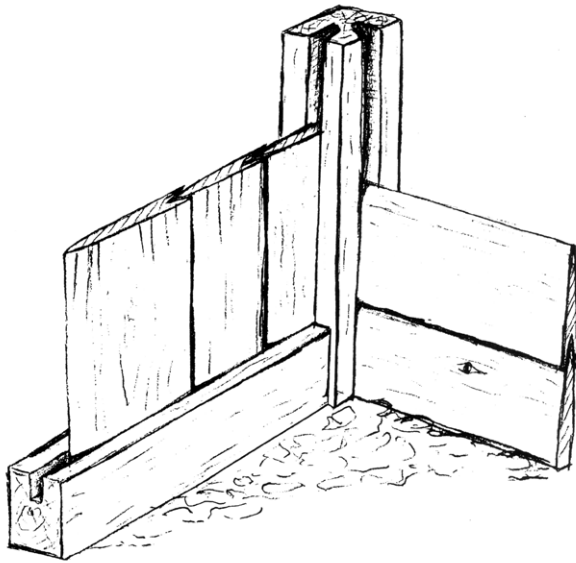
A reconstruction drawing showing planks slotted into beams to make walls. Drawing M.J.A. de Haan, source Dijkstra 1998, p. 26, Fig. 13.
